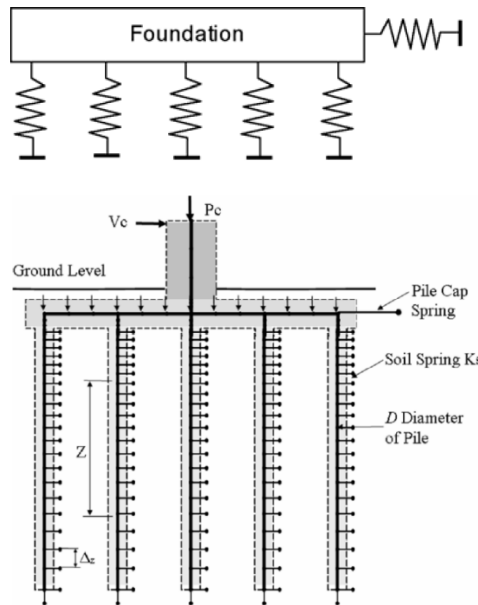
A.1: SSI model for flexible base model using Winkler spring for shallow foundation and deep pile foundation
